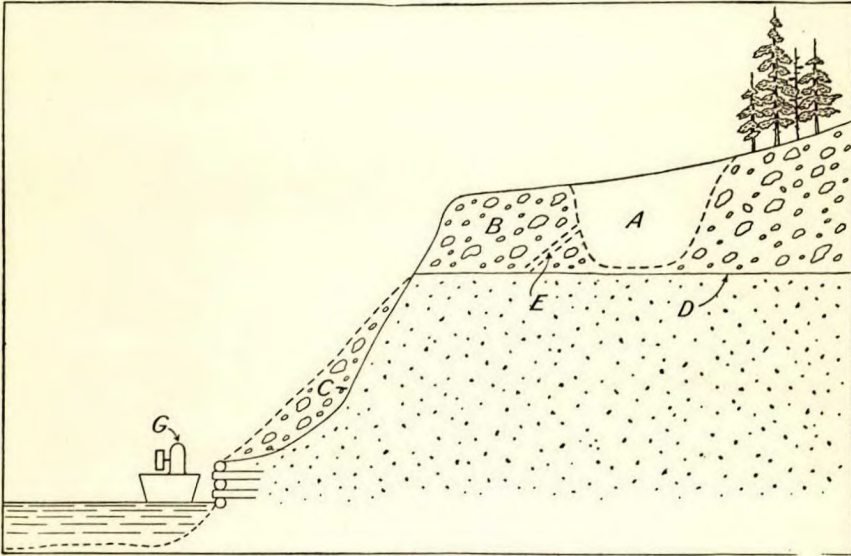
Section illustrating method adopted at McMurray for removal of overburden. A, cut made by slip scraper; B, overburden; C, overburden broken down by blasting; D, upper surface of bituminous sand; E, 6-inch holes for blasting; G, pump belted to tractor and mounted on scow, (capacity, 500 gallons per minute, 50 pounds pressure, $1\frac{1}{2}$ -inch nozzle).
